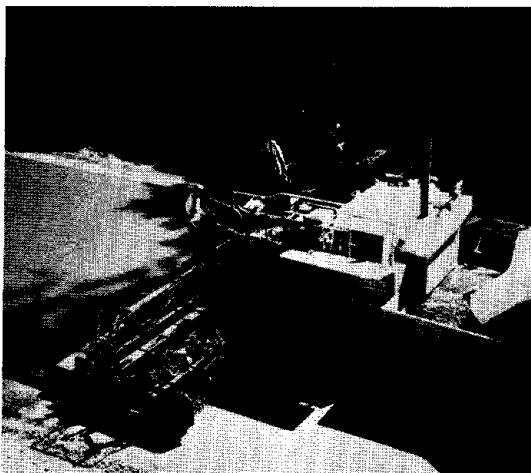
Paving of PCC pavement in Norway. Width: 7.5 m, thickness: 16 m. Paving speed: approx. 0.7 m/min.
